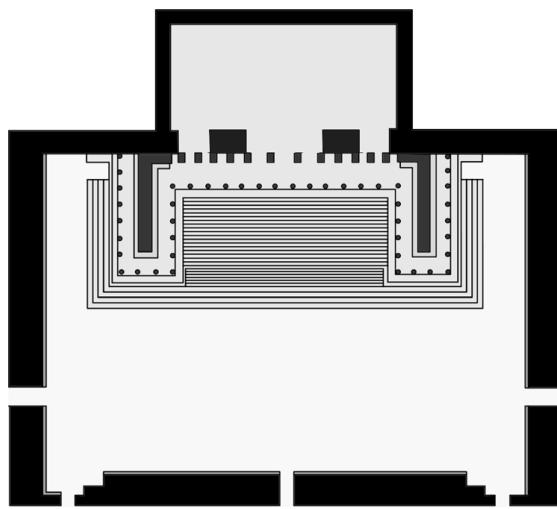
Pergamon Room plan drawing, created by the author, over an original drawing.
